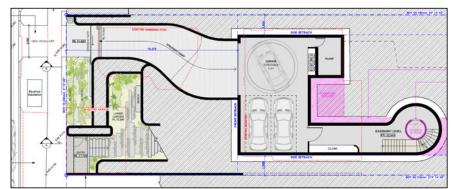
Example of a vehicle turntable in the basement level of a dwelling house
